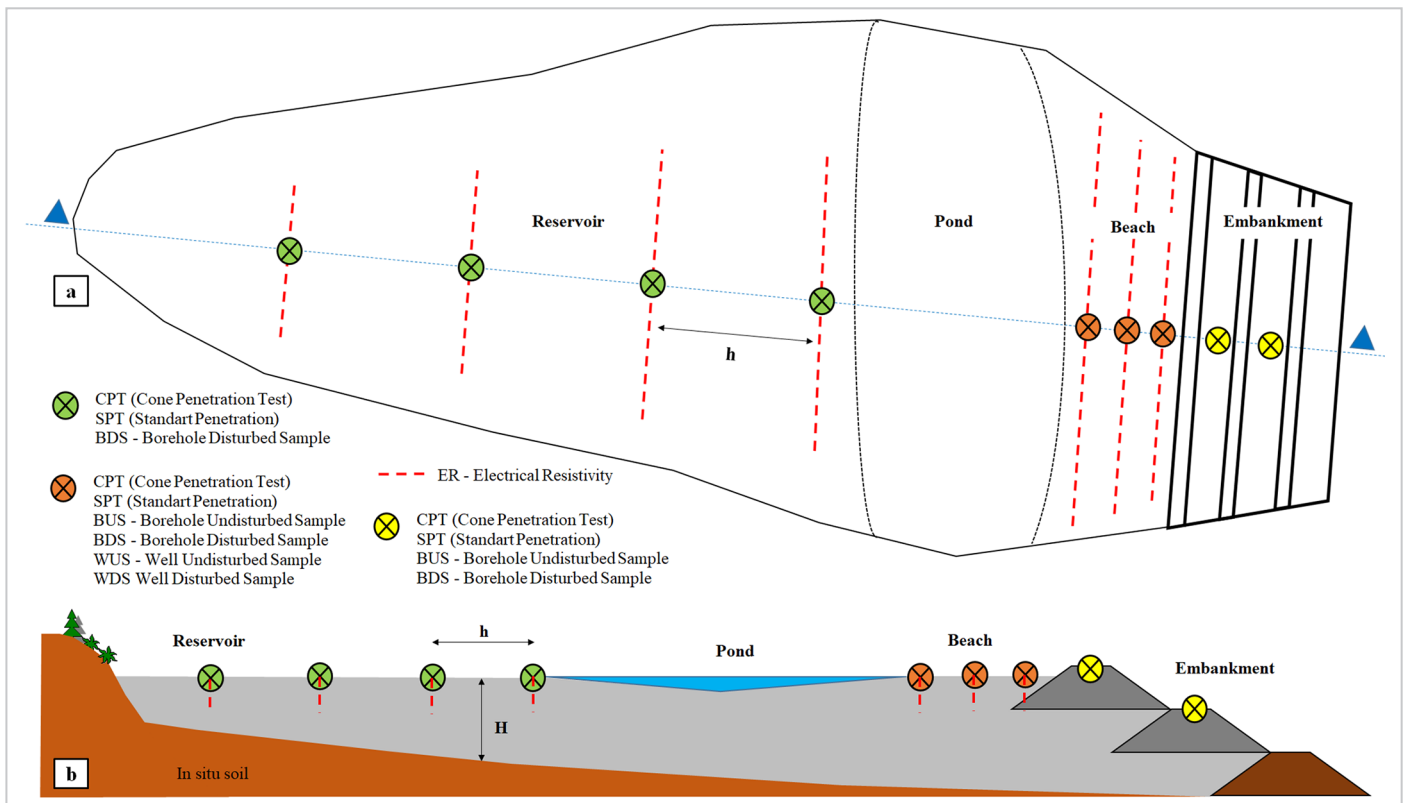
Layout proposed for optimized investigation plan: (a) plan view; (b) section.
